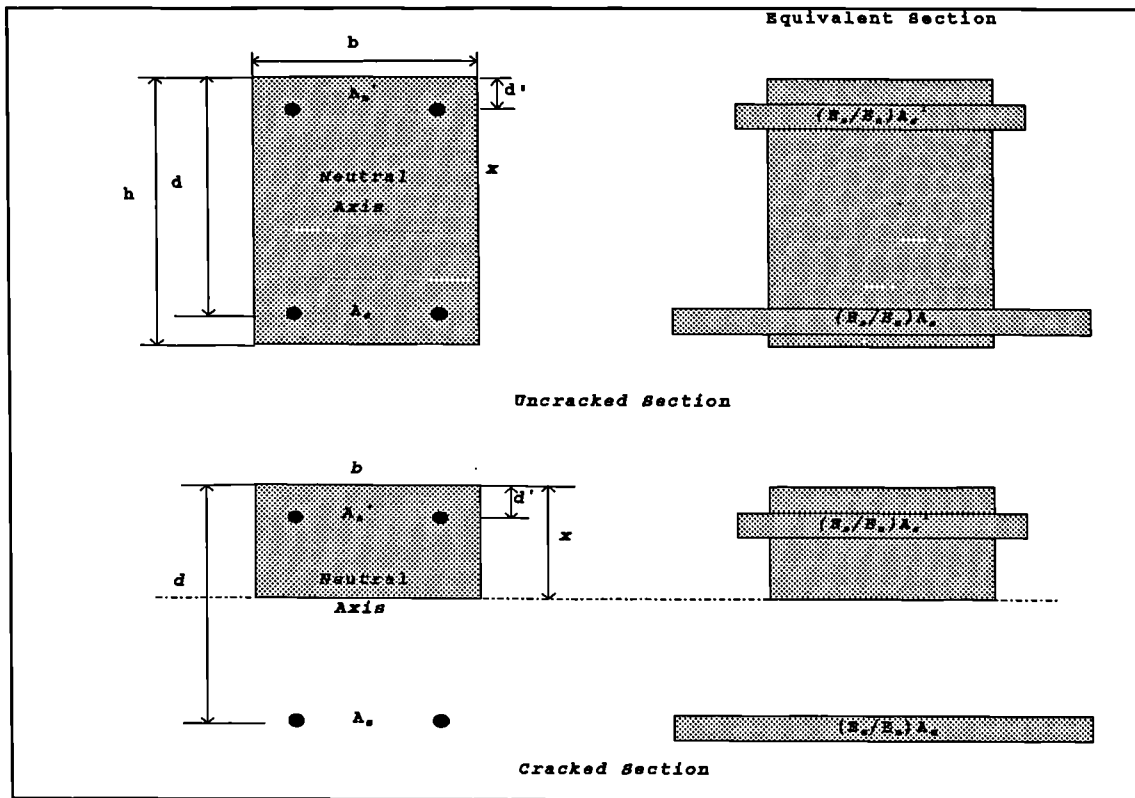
Equivalent sections for uncracked and cracked beam cross sections.
